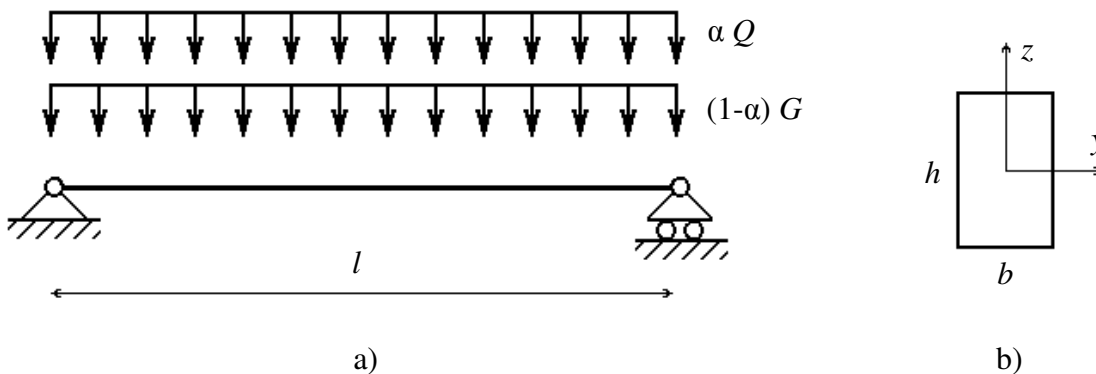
Single supported beam: a) structural model; b) cross section.
